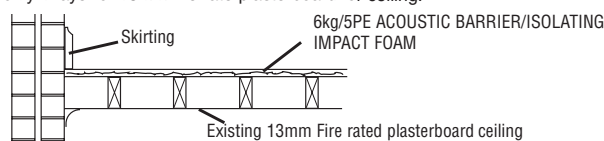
Intermediate floor to exceed RW45 - To insulate timber floors where soft floor coverings are proposed (Rw 42) with only 1 layer of 13mm fire rate plasterboard for ceiling.
